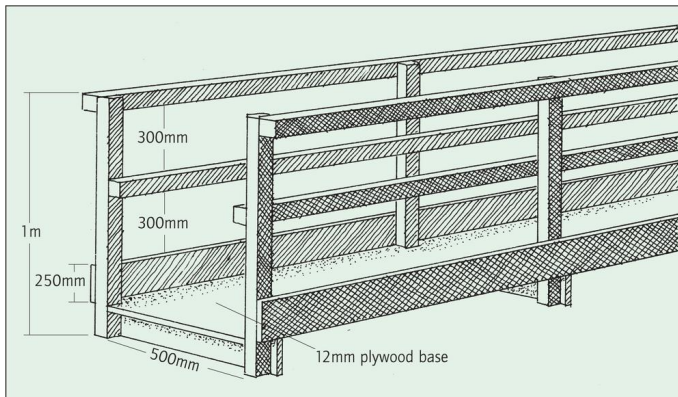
The walkthrough feed trough is a double-sided feeder for hay, silage and concentrates. It also subdivides pens and is a good observation area. Uprights and rails are 50mm × 50mm timber and the planking is 25mm thick. Make sure that timbers are smooth. (Not to scale.)
